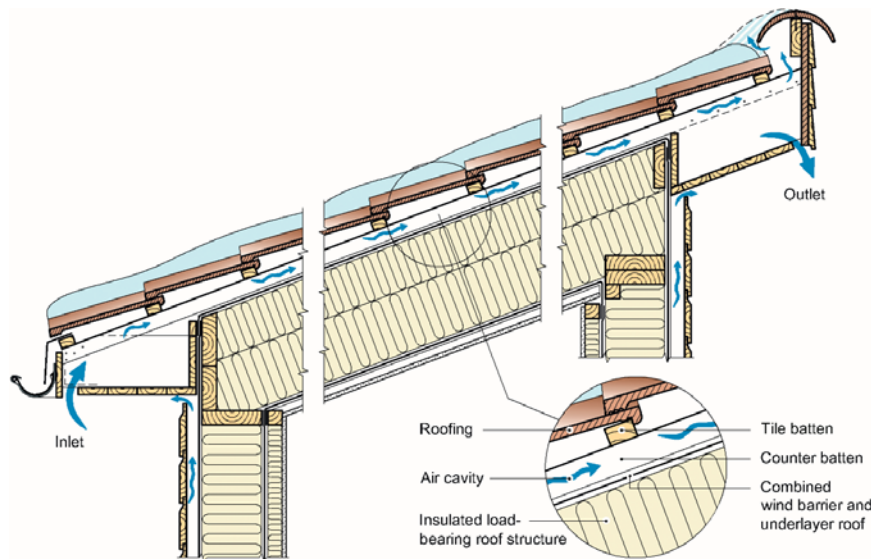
A ventilated lean-to roof structure with snow on the roof. The snow may reduce the air flow through the opening in the upper air cavity opening. The structure has the following build up from the cold face of the structure: roofing, ventilated air cavity, combined wind barrier and underlayer roof and an insulated load-bearing roof structure closed by the vapour retarder and the ceiling at the interior face.
